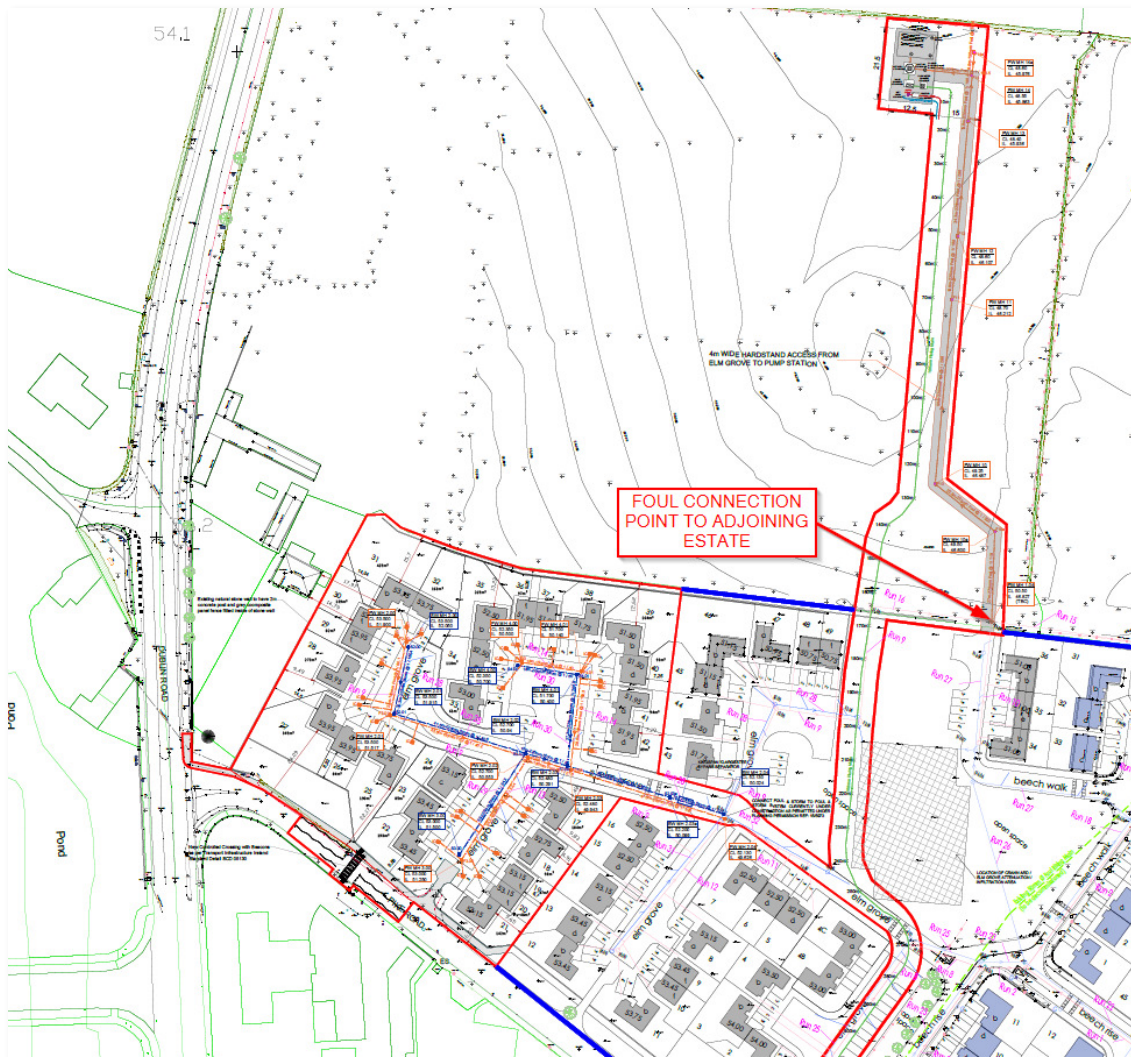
Foul Sewer Connection Point to adjoining site and onto proposed pumping station.
